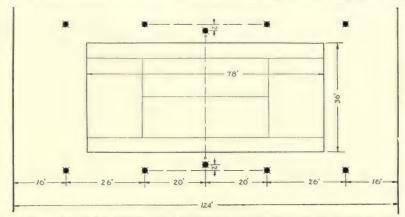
PLAN VIEW OF LIGHTING SYSTEM FOR A SINGLE COURT
